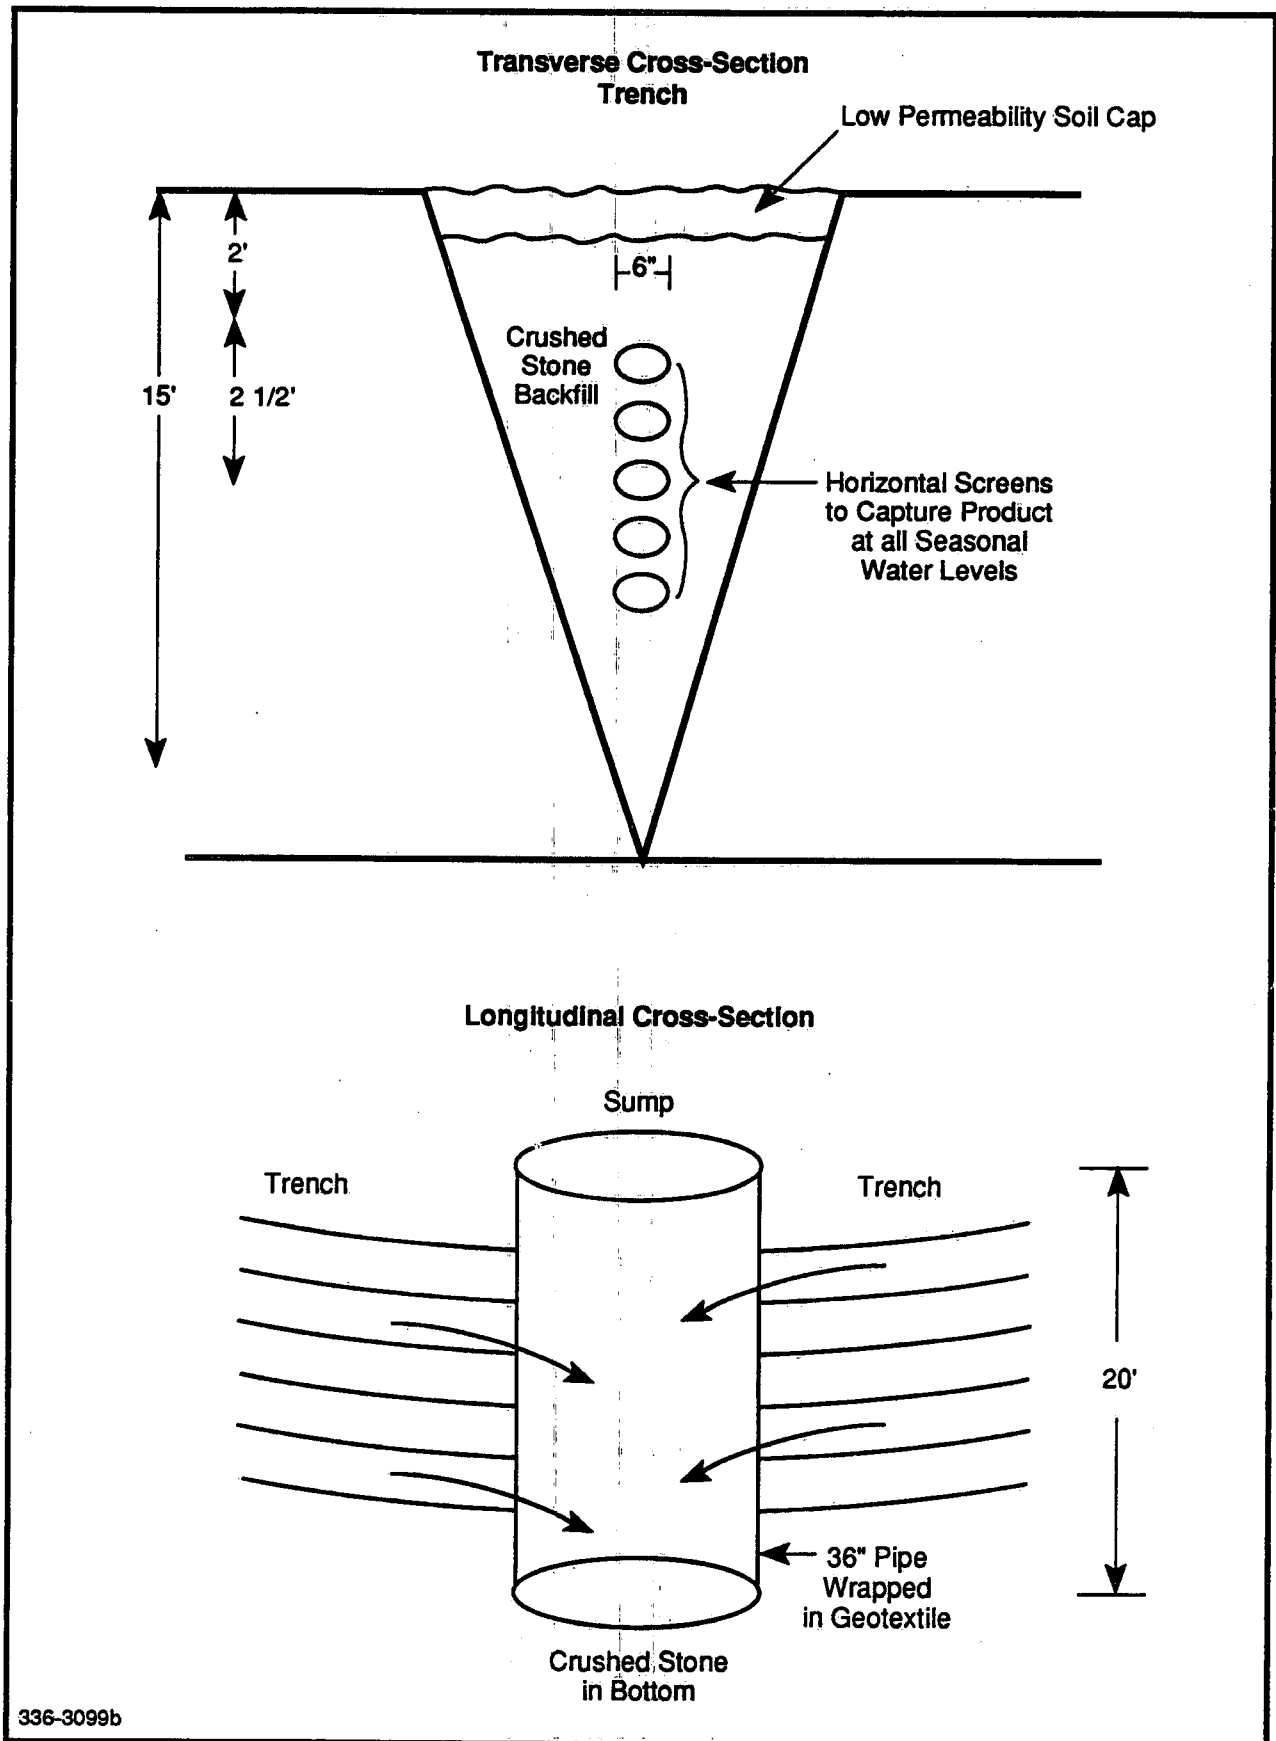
RECOVERY TRENCH ALTERNATIVE: CONSTRUCTION DETAIL
